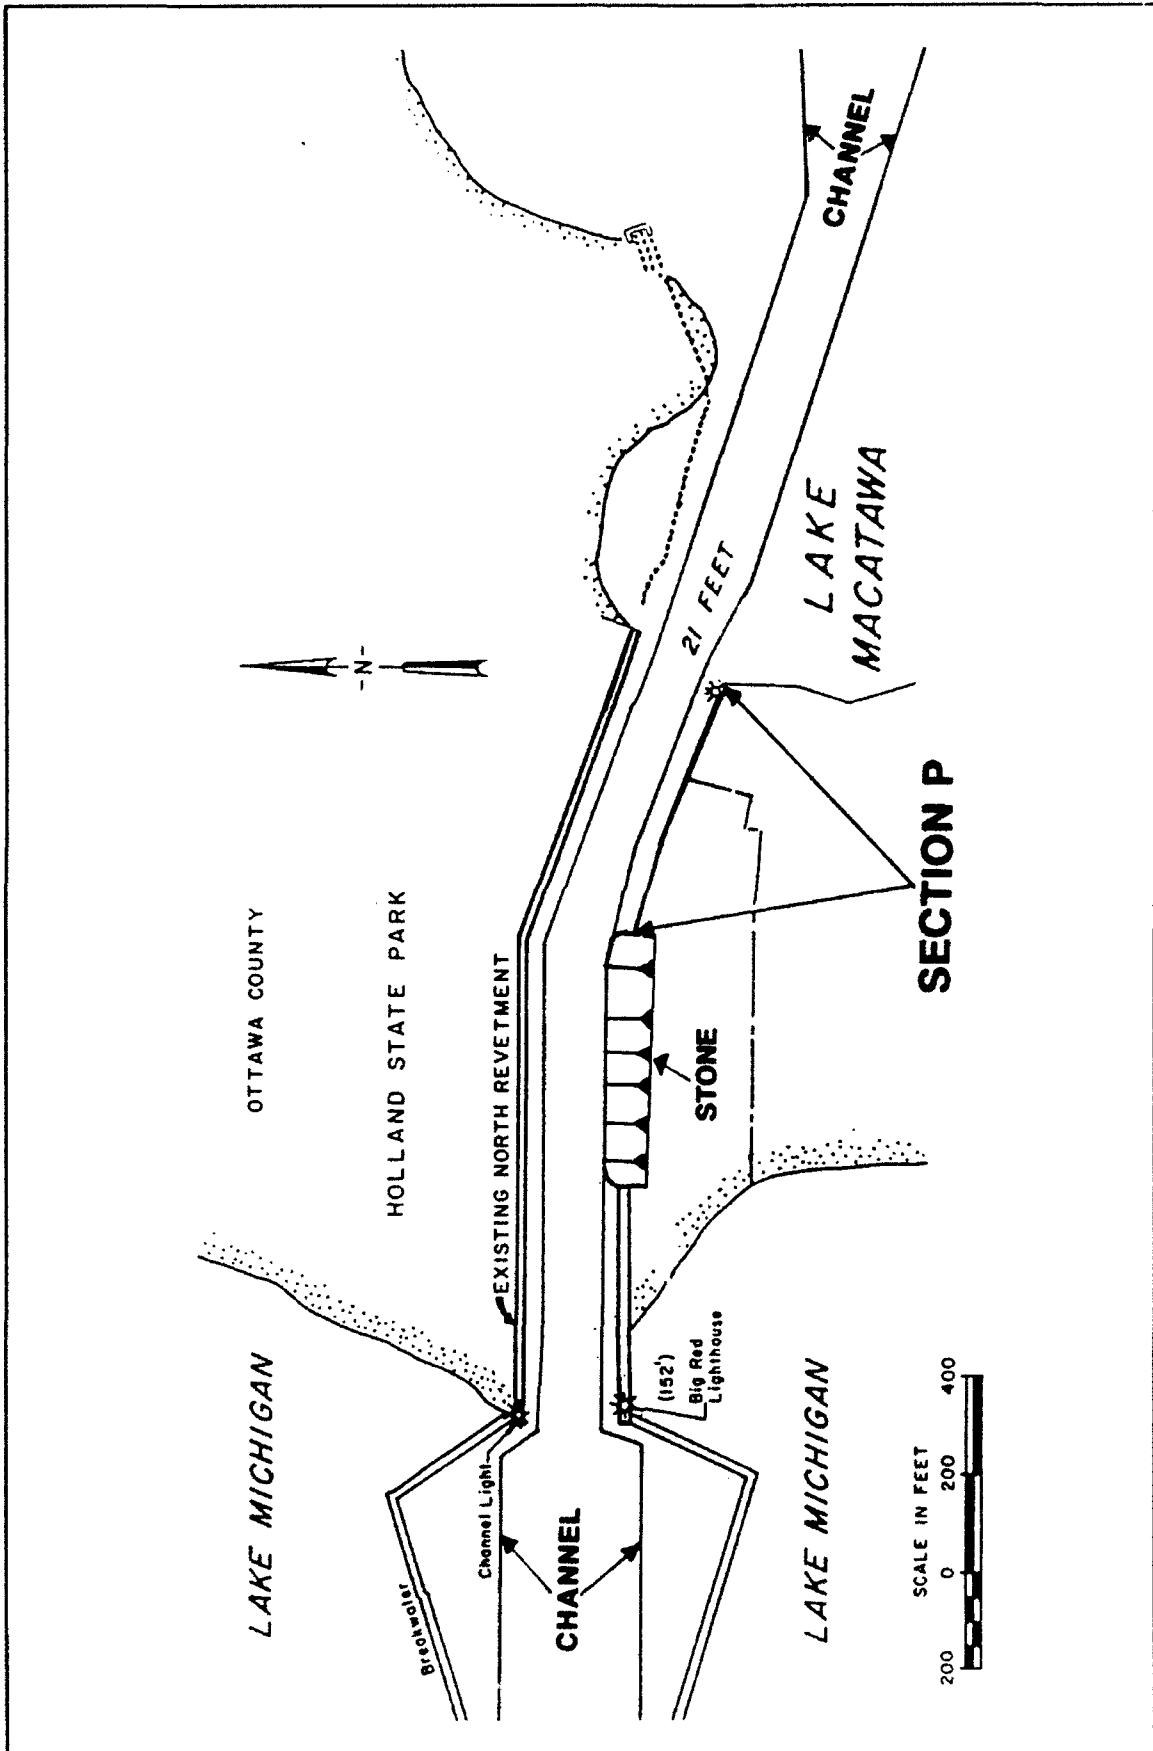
Section of earth anchor project requiring steel sheet-pile wall
